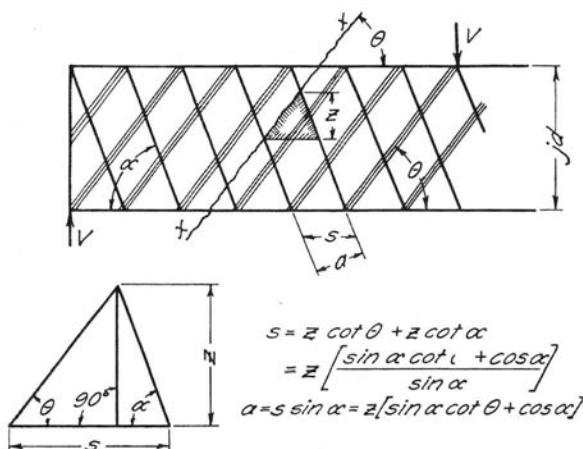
TRUSS WITH INCLINED TENSION WEB MEMBERS
